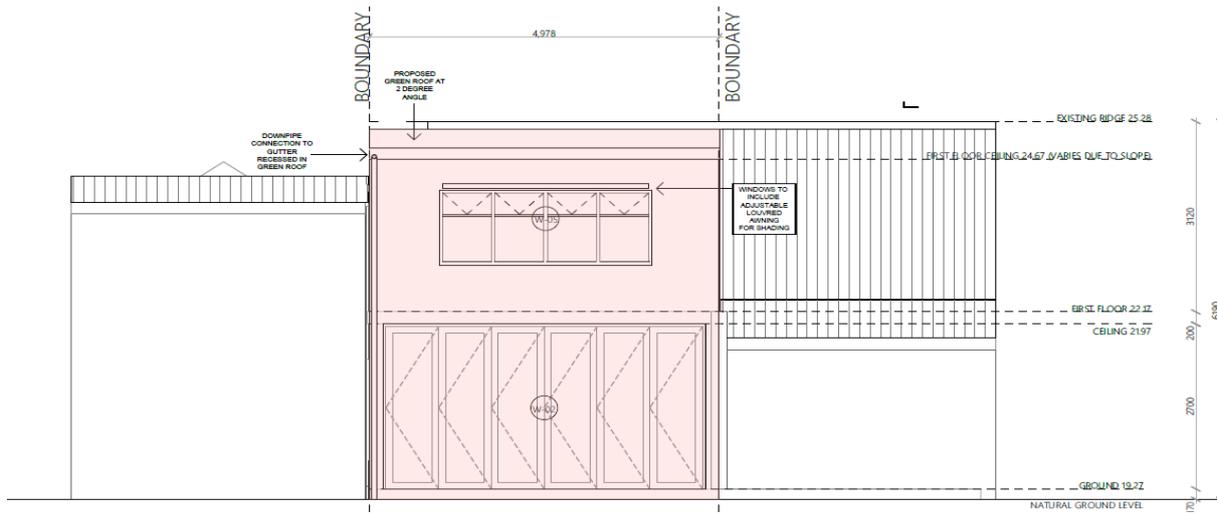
Proposed East Elevation (extent of new works outlined in red)
